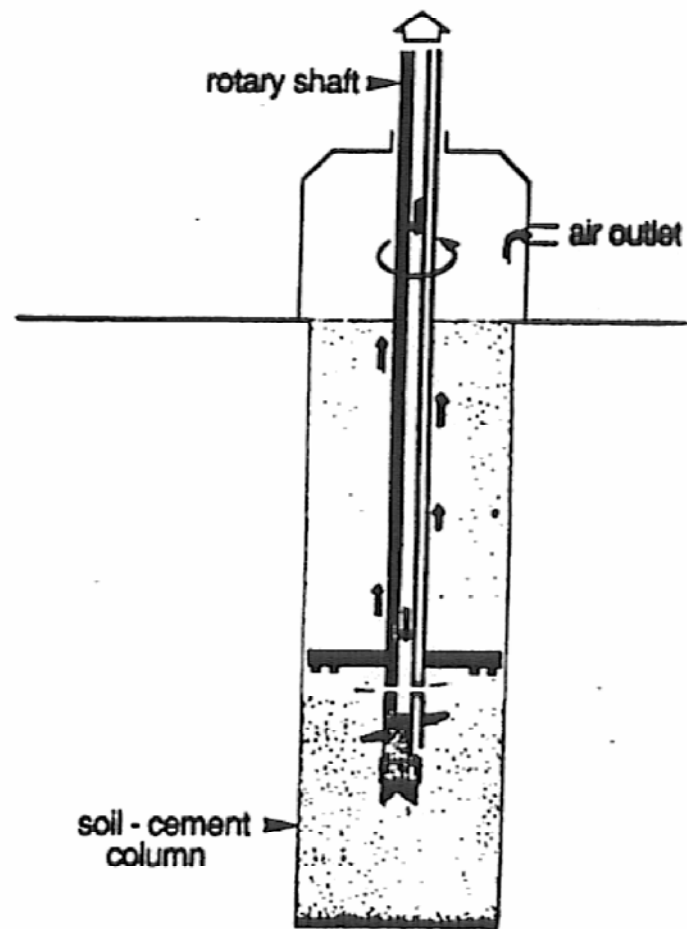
Excavation and mixing phases of column installation (Rodio, 1990).
